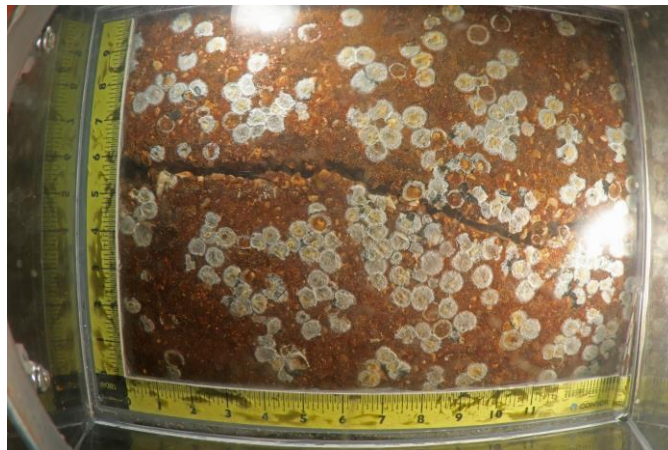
Photo. Cracking in precast concrete pile due to overdriving during installation. (Source FHWA).
